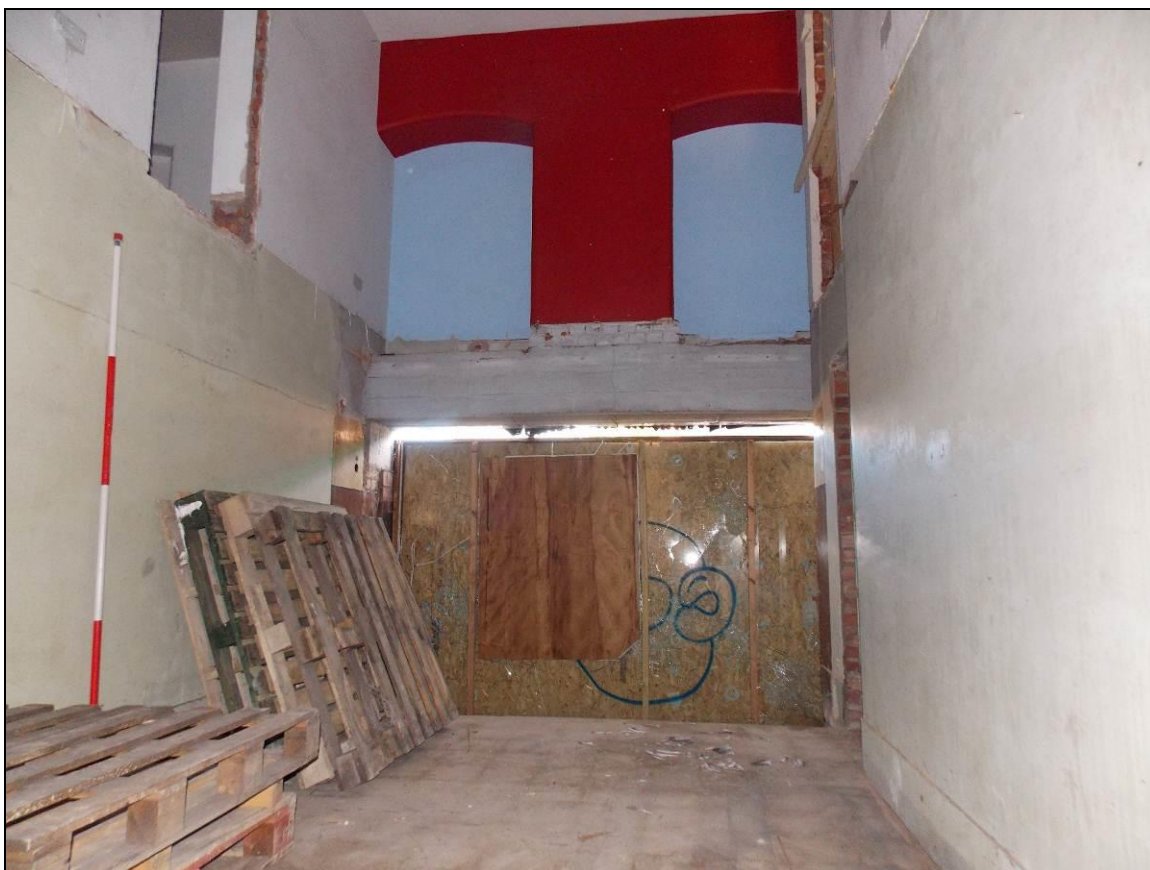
View of the north-west wall of room G3; the first floor ceiling is absent, 2m scale.
